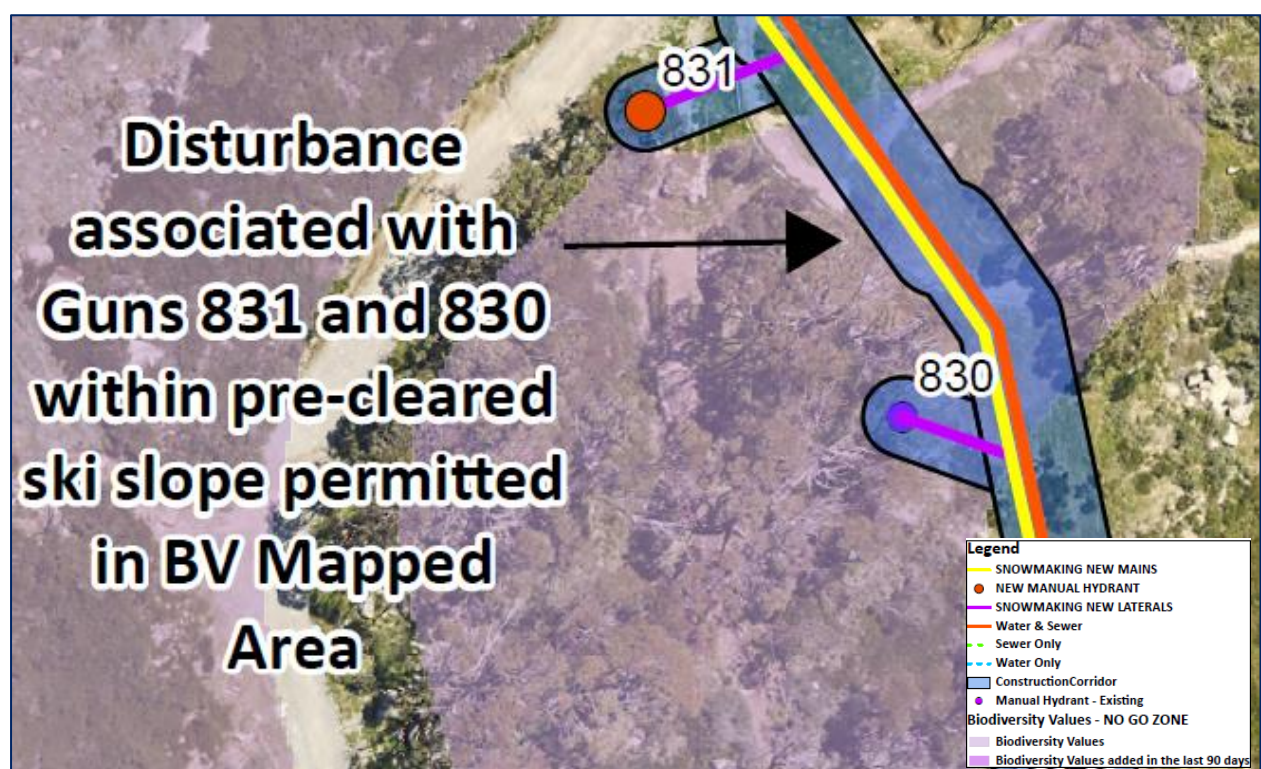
| BVM and area of works and construction corridor intersecting (Source: Applicant's documentation)
